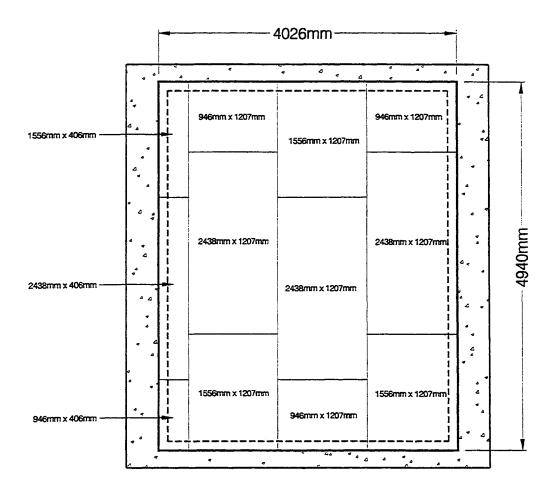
Base layer subfloor layout, joists 610 mm o.c.
